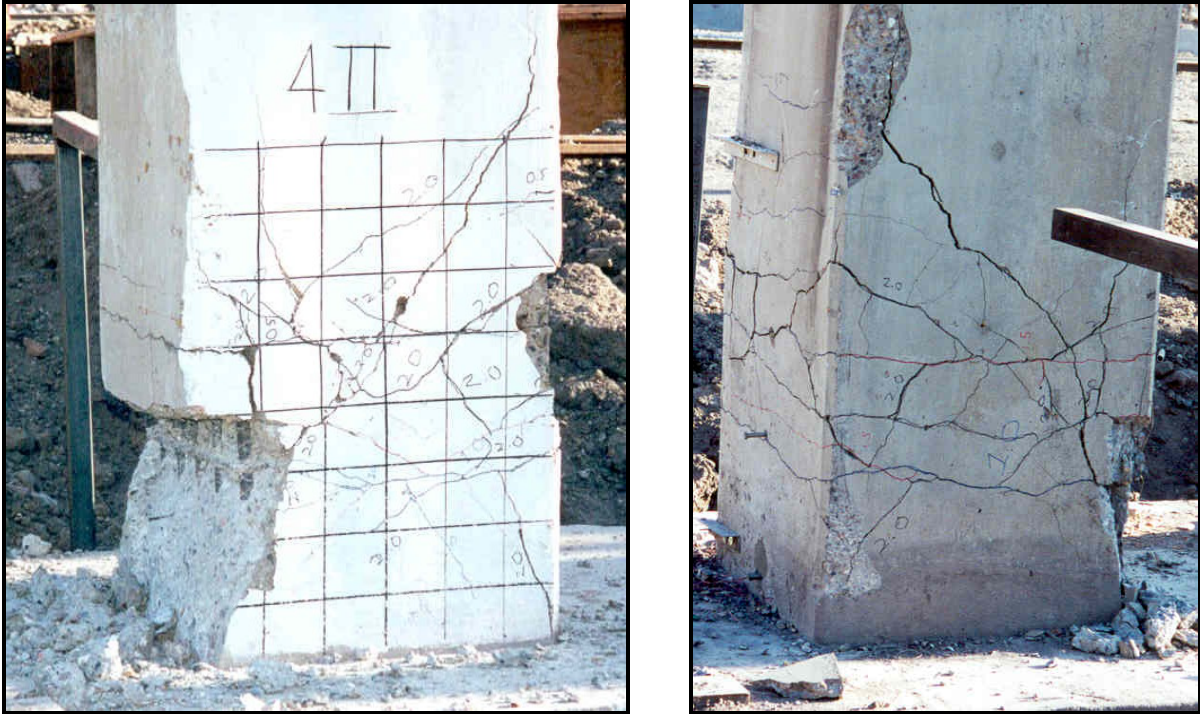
Center column base at 5% drift: (a) West side and Southwest corner showing buckled bars, (b) North face
